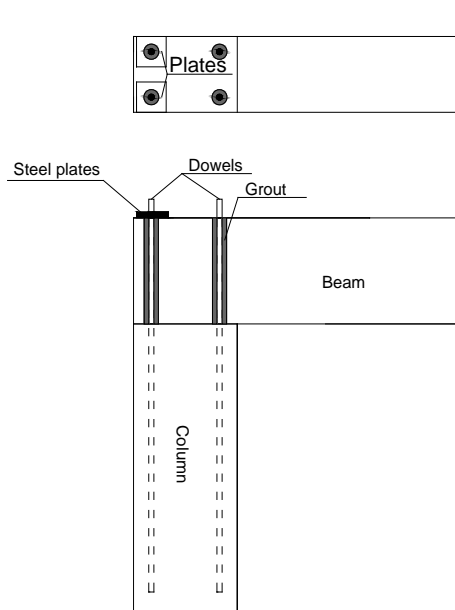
Upgrading of the connection with steel plates to prevent pullout failure
